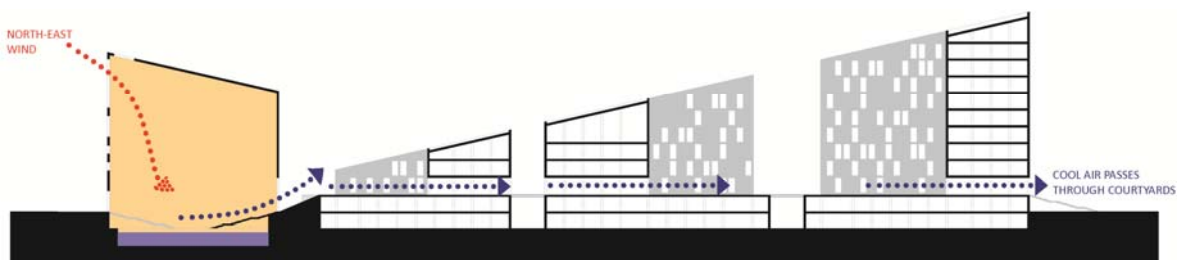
East-west section of the proposed shadow umbrella, Source: Author
